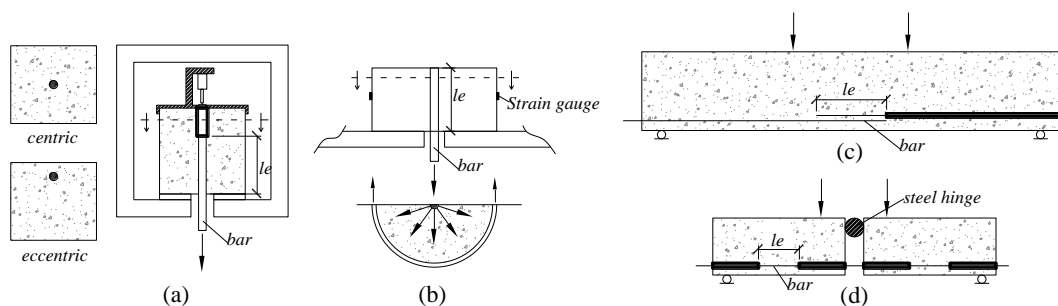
Schematic illustration of bond test setups: (a) Direct pullout, (b) Ring, (c) Splice, and (d) Beam test
